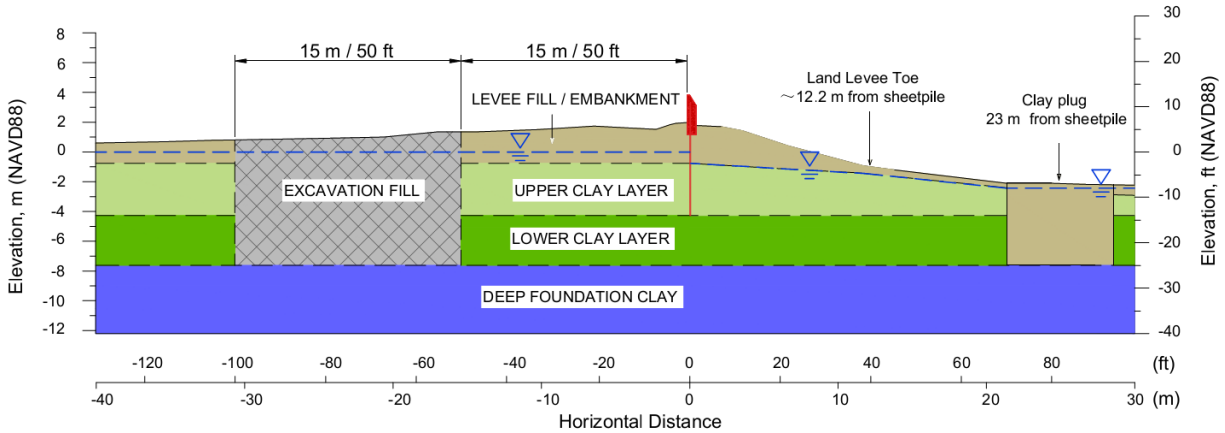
Parametric study soil profile showing floodside excavation, sheet pile wall supported floodwall, and a landside backfilled excavation
